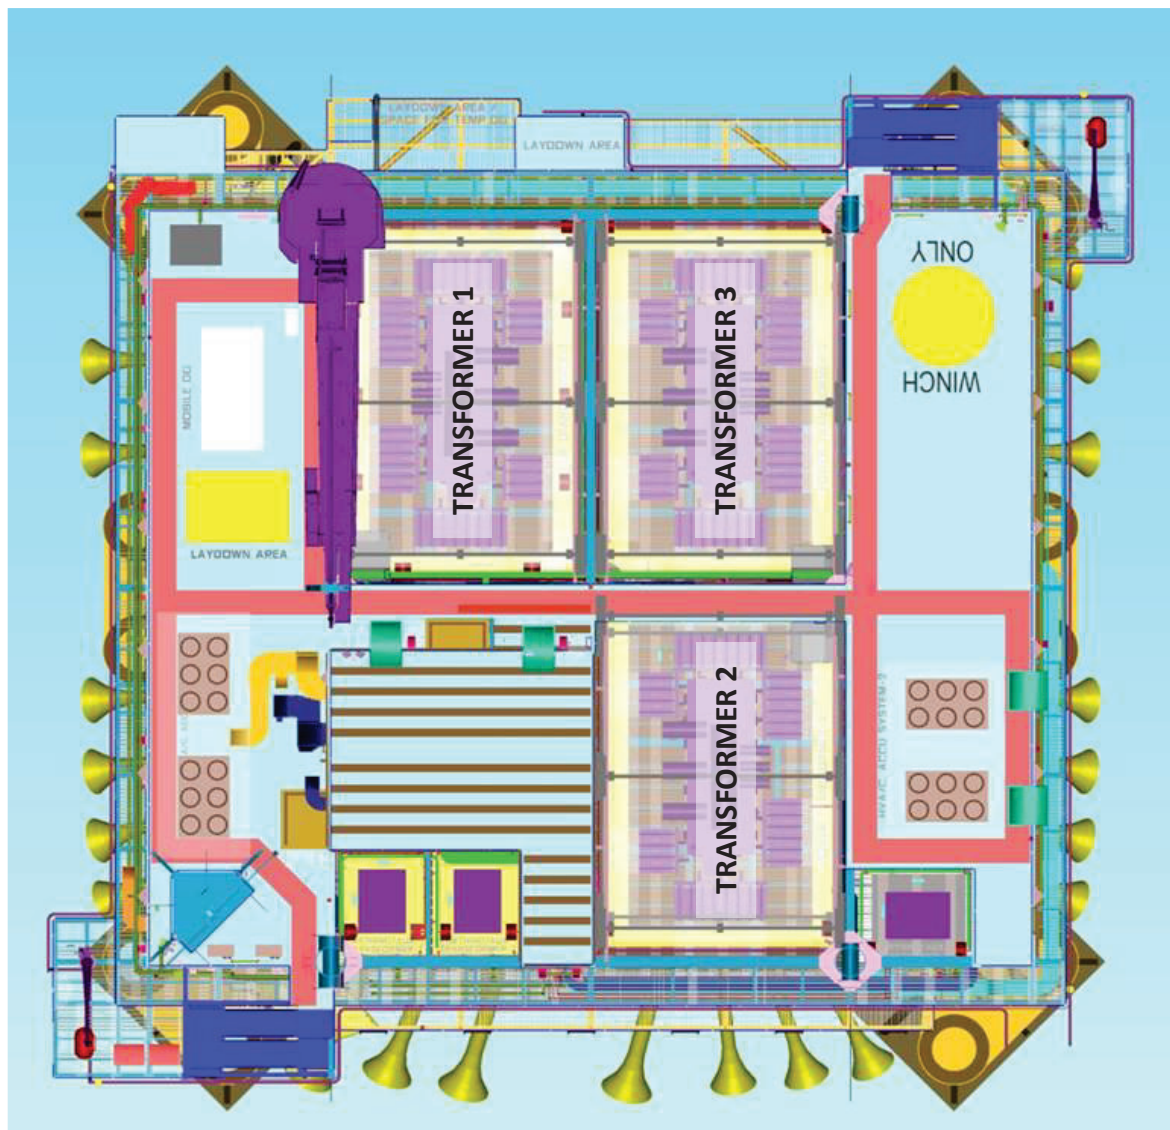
OSP General Arrangement – Roof Deck Plan
